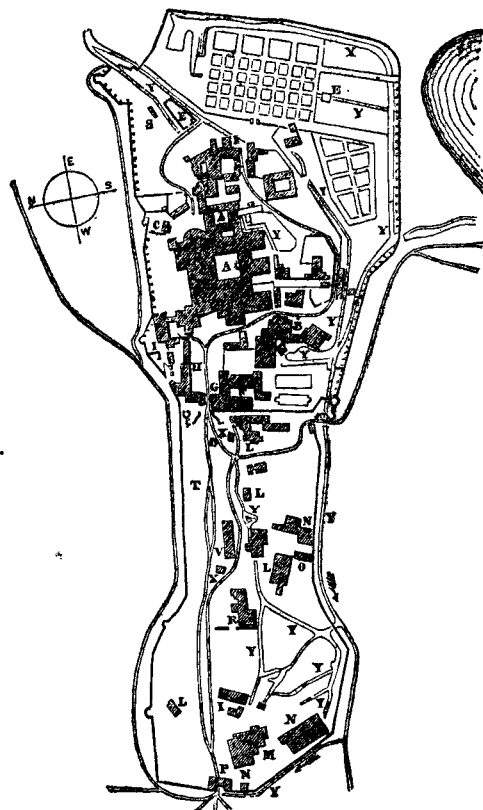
Clairvaux, No. 1 (Cistercian), General Plan.
